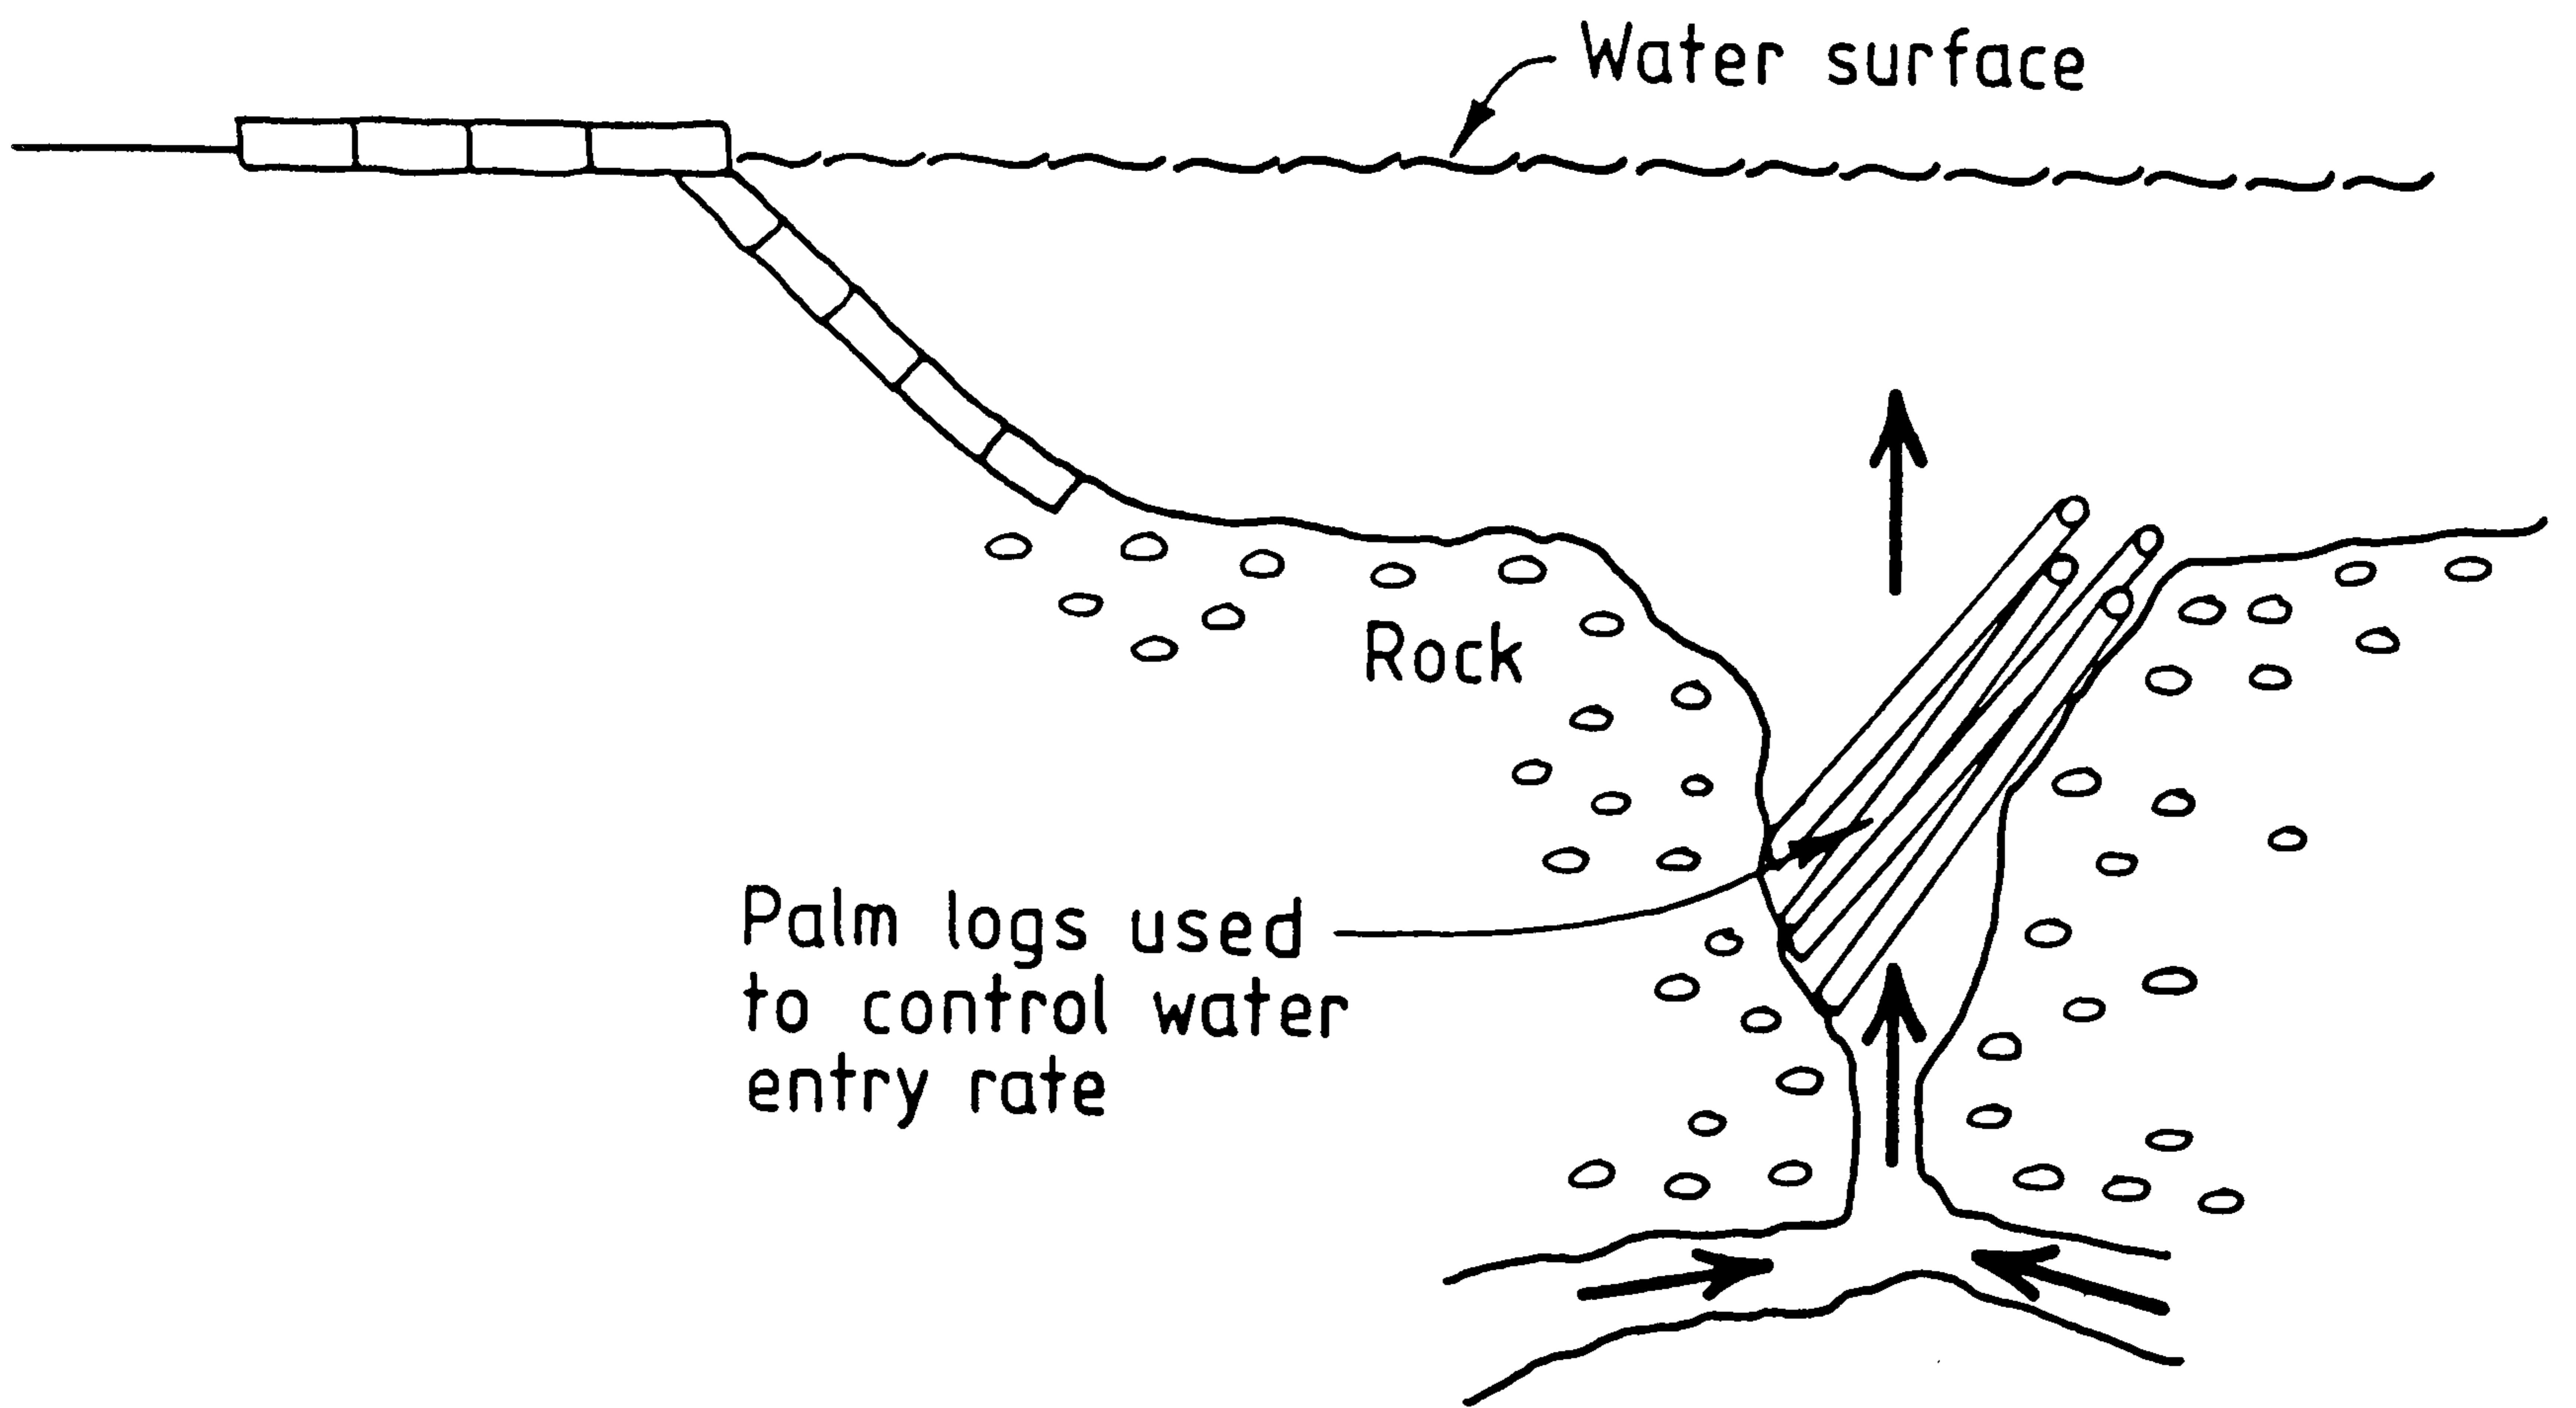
TYPICAL CROSS-SECTION THROUGH
